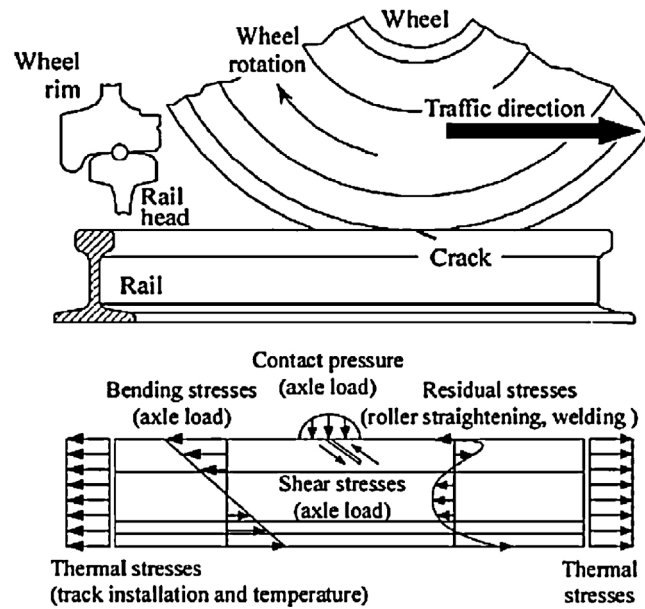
Loading components acting at a continuously welded rail during vehicle passing [2].
